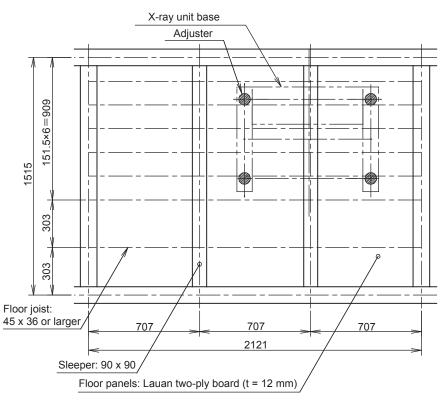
Example of conventional wooden construction with floor joist reinforcing (wide base-mounted)
